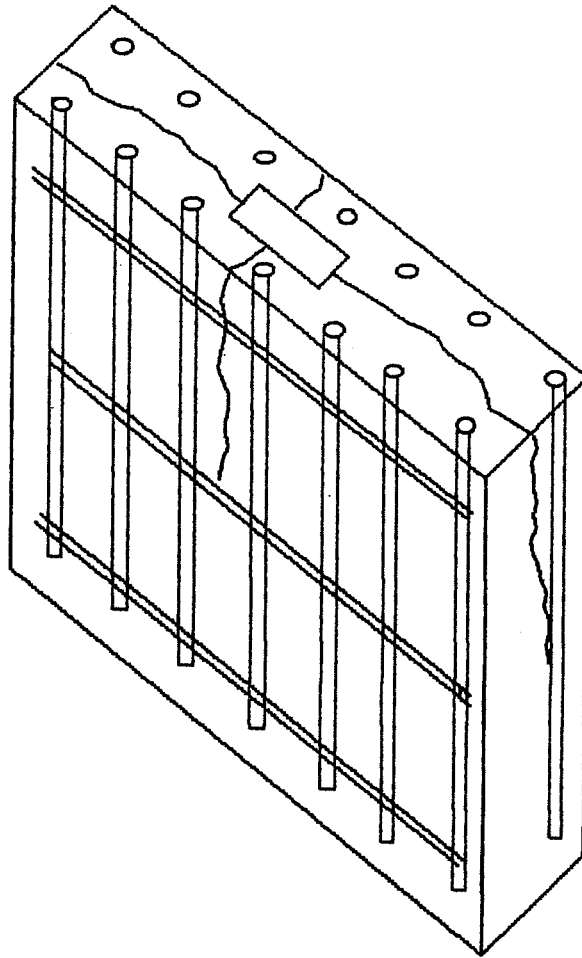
Failure sequence for single monostrand anchorage specimens
